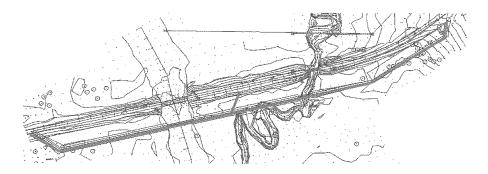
Plan of Detour Road of Muera I and Muera II Bridge
